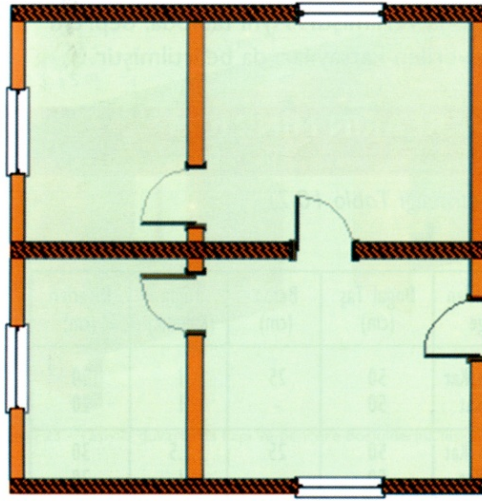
Symmetrically Located Load Bearing Walls in Two Orthogonal Direction
